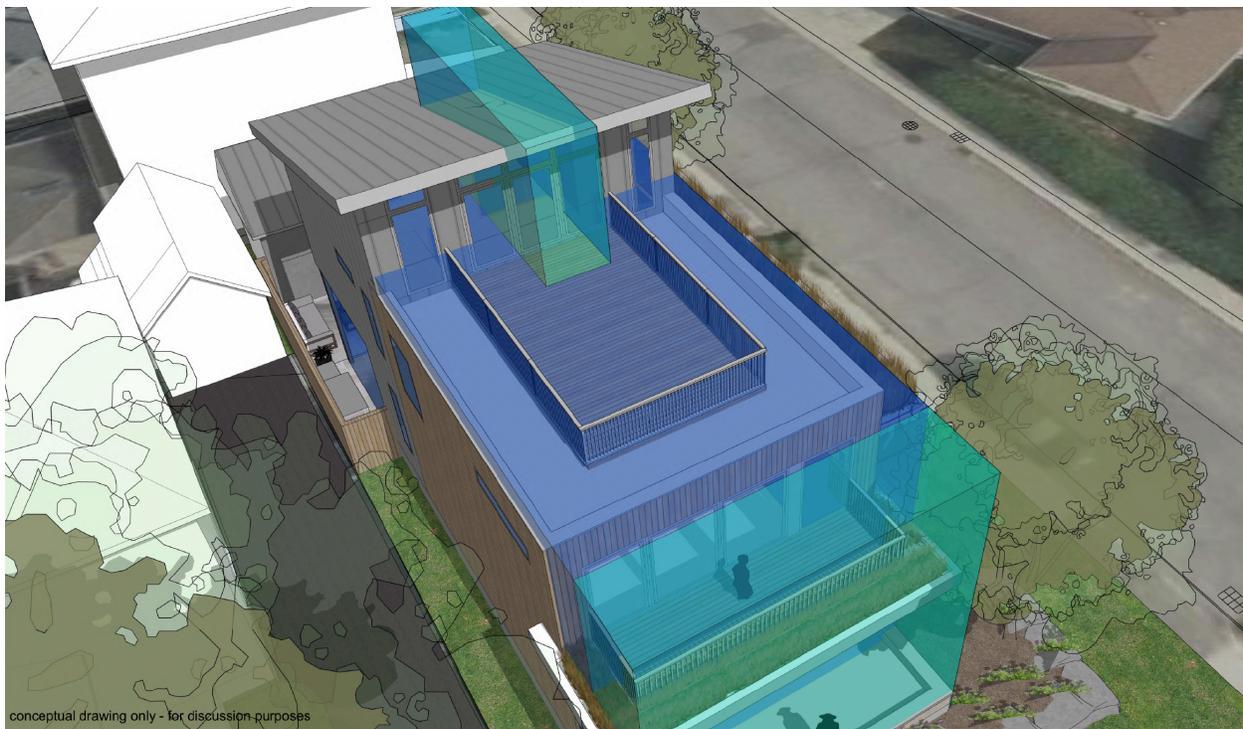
Conceptual Rendering illustrating as of right height in 8.5 m box (blue) as well as the portion of the building elevation that is proposed to be larger than the height limit. (Source: Ardington & Associates)
